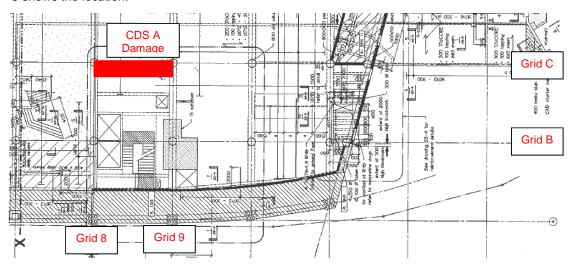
Location of transverse crack to hollowcore ground floor unit
